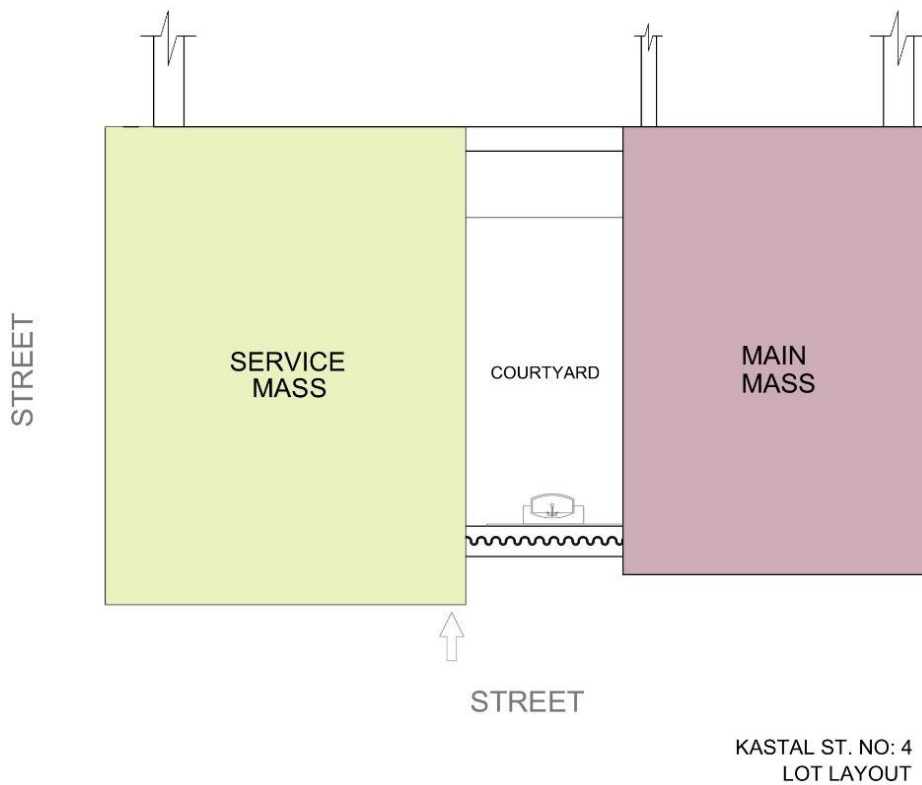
Lot layout of Kastal-4 House (Author, 2023)
